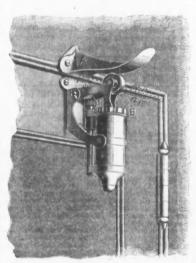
Position of House Liquid Doo Check when Door is Closed.
